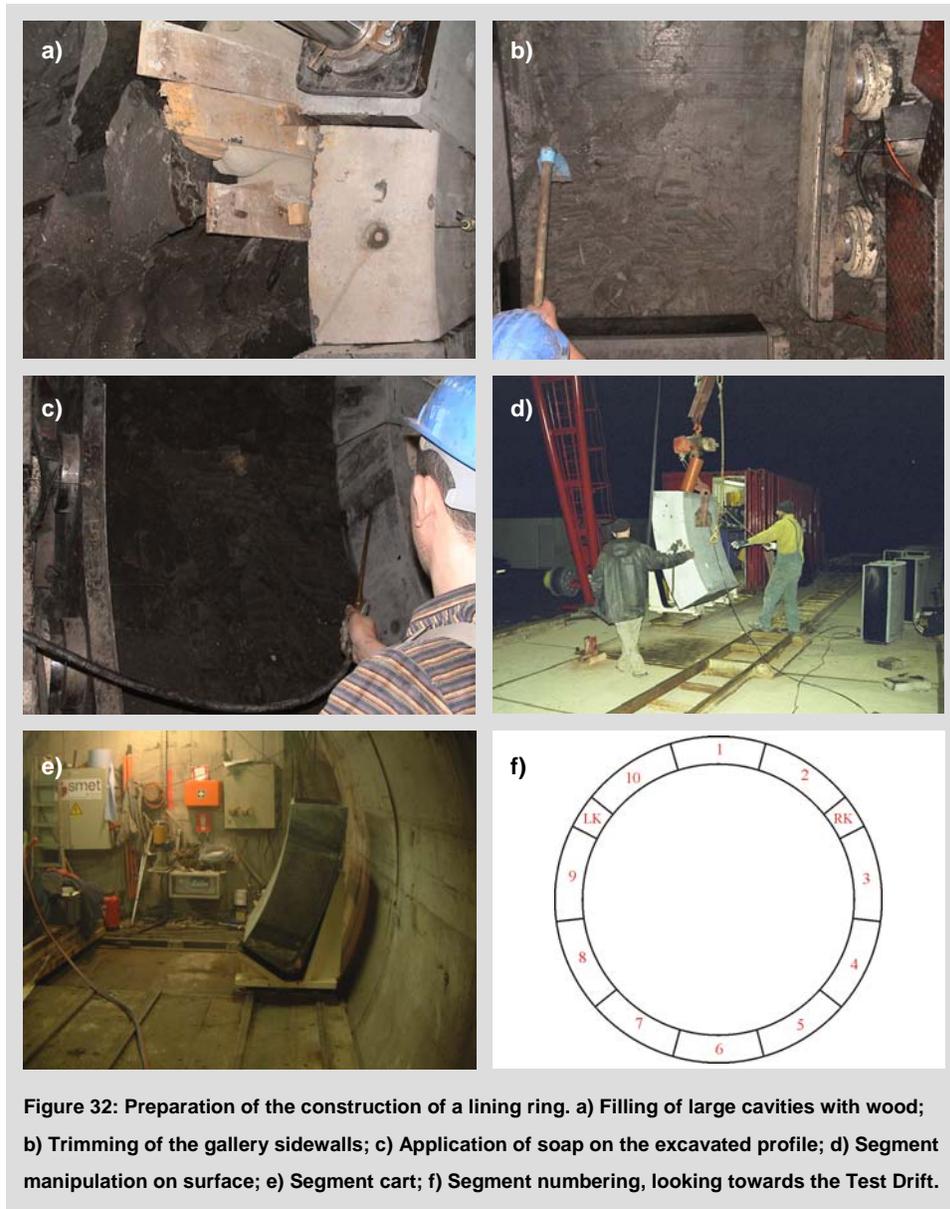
Preparation of the construction of a lining ring. a) Filling of large cavities with wood; b) Trimming of the gallery sidewalls; c) Application of soap on the excavated profile; d) Segment manipulation on surface; e) Segment cart; f) Segment numbering, looking towards the Test Drift.
